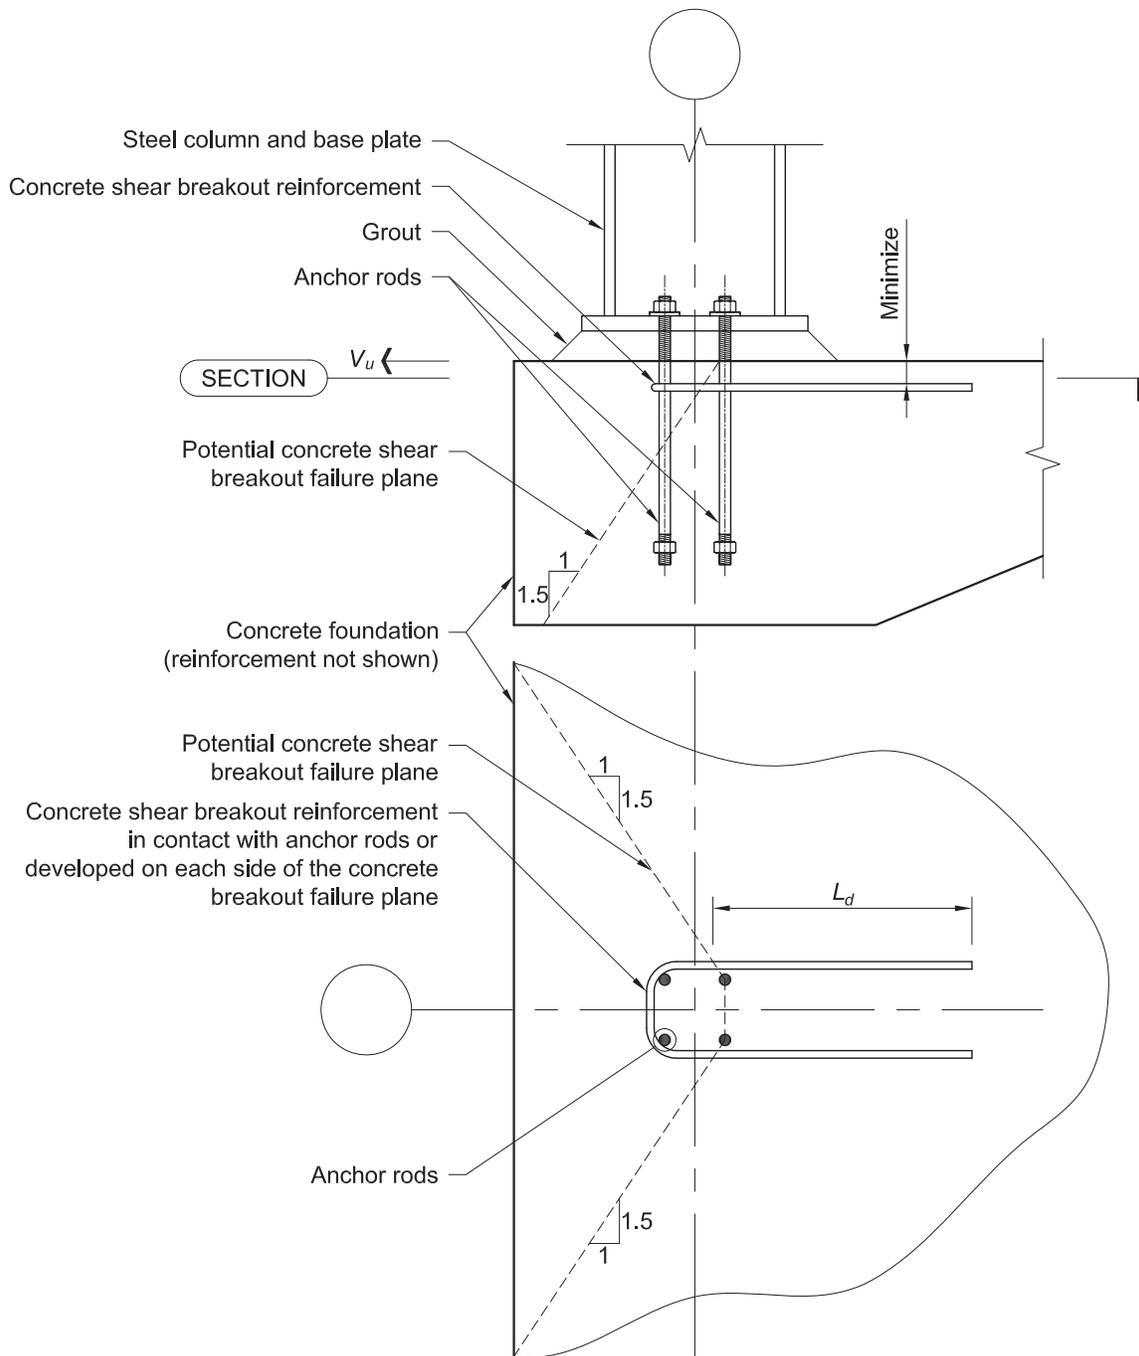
The use of steel reinforcement for restraining shear concrete breakout.
